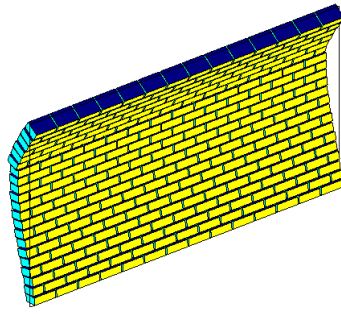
Failure mechanism for the masonry panel loaded by a set of wooden beams and simply supported at its base considered by Restrepo Vélez et al. (2014) modelled with DEM.
